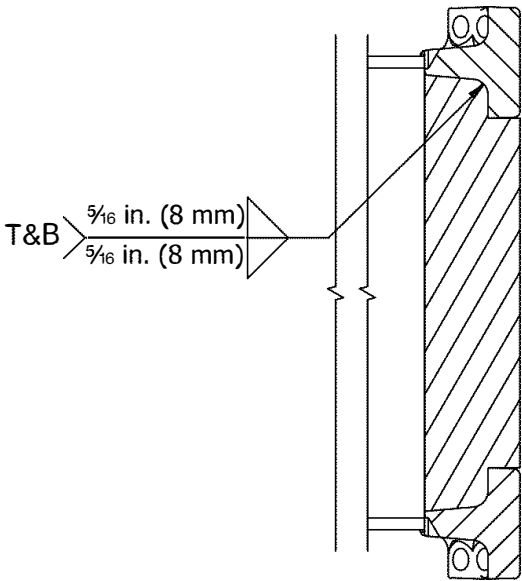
Collar-web-extension-to-collar-flange welds, elevation.
